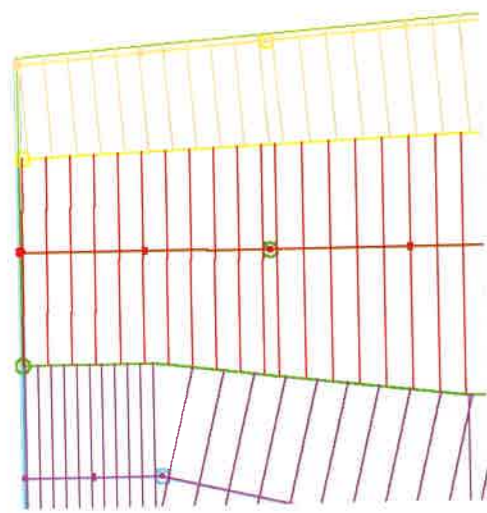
E-2 Elevation of Design Strip for Analysis (P657)
